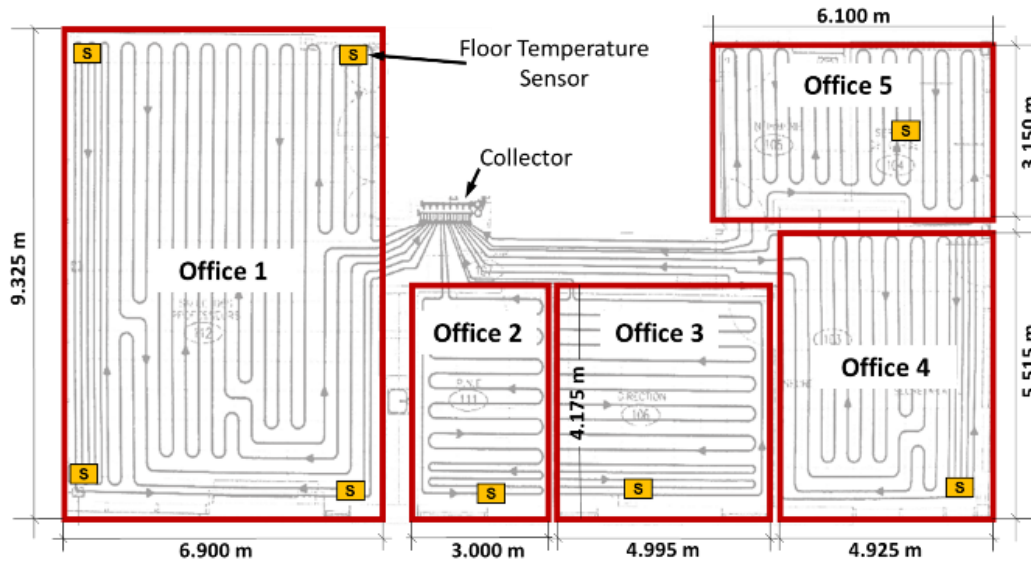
Plan view of the offices with hydronic radiant floor system.
